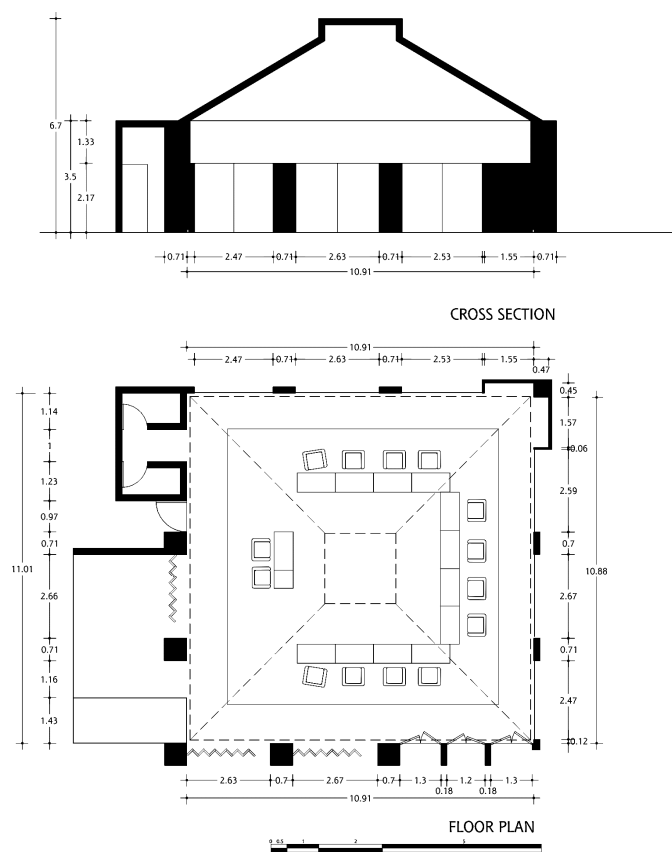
Floor plan and section of the Academic Council Hall, Design School of the UAM-A
